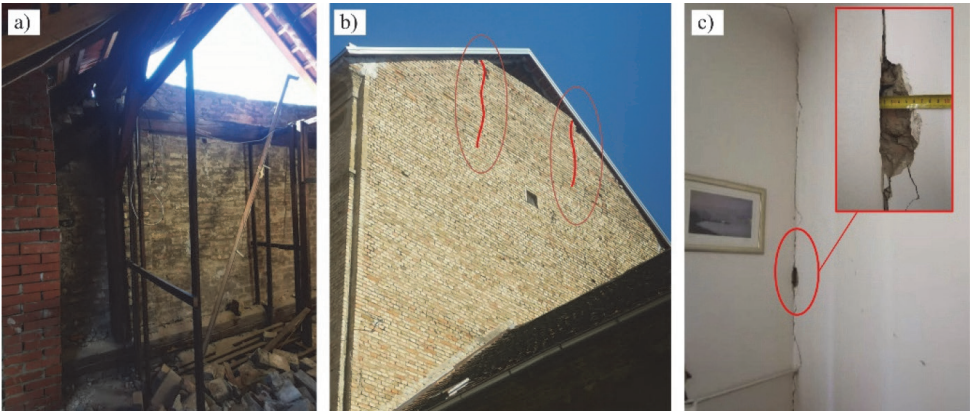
a) Gable wall inside the attic; b) Crack patterns of gable wall; c) Cracks on the connection of facade wall and perpendicular wall
